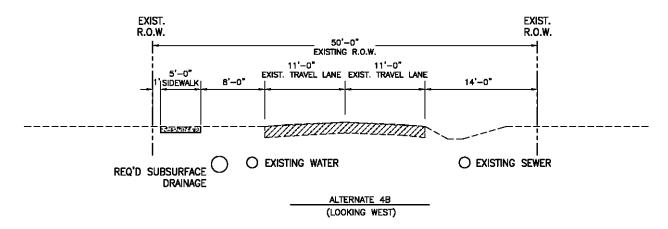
Typical Roadway Section with Proposed Sidewalk along the south side of Minnesota Park Road (Source: RCLC)
